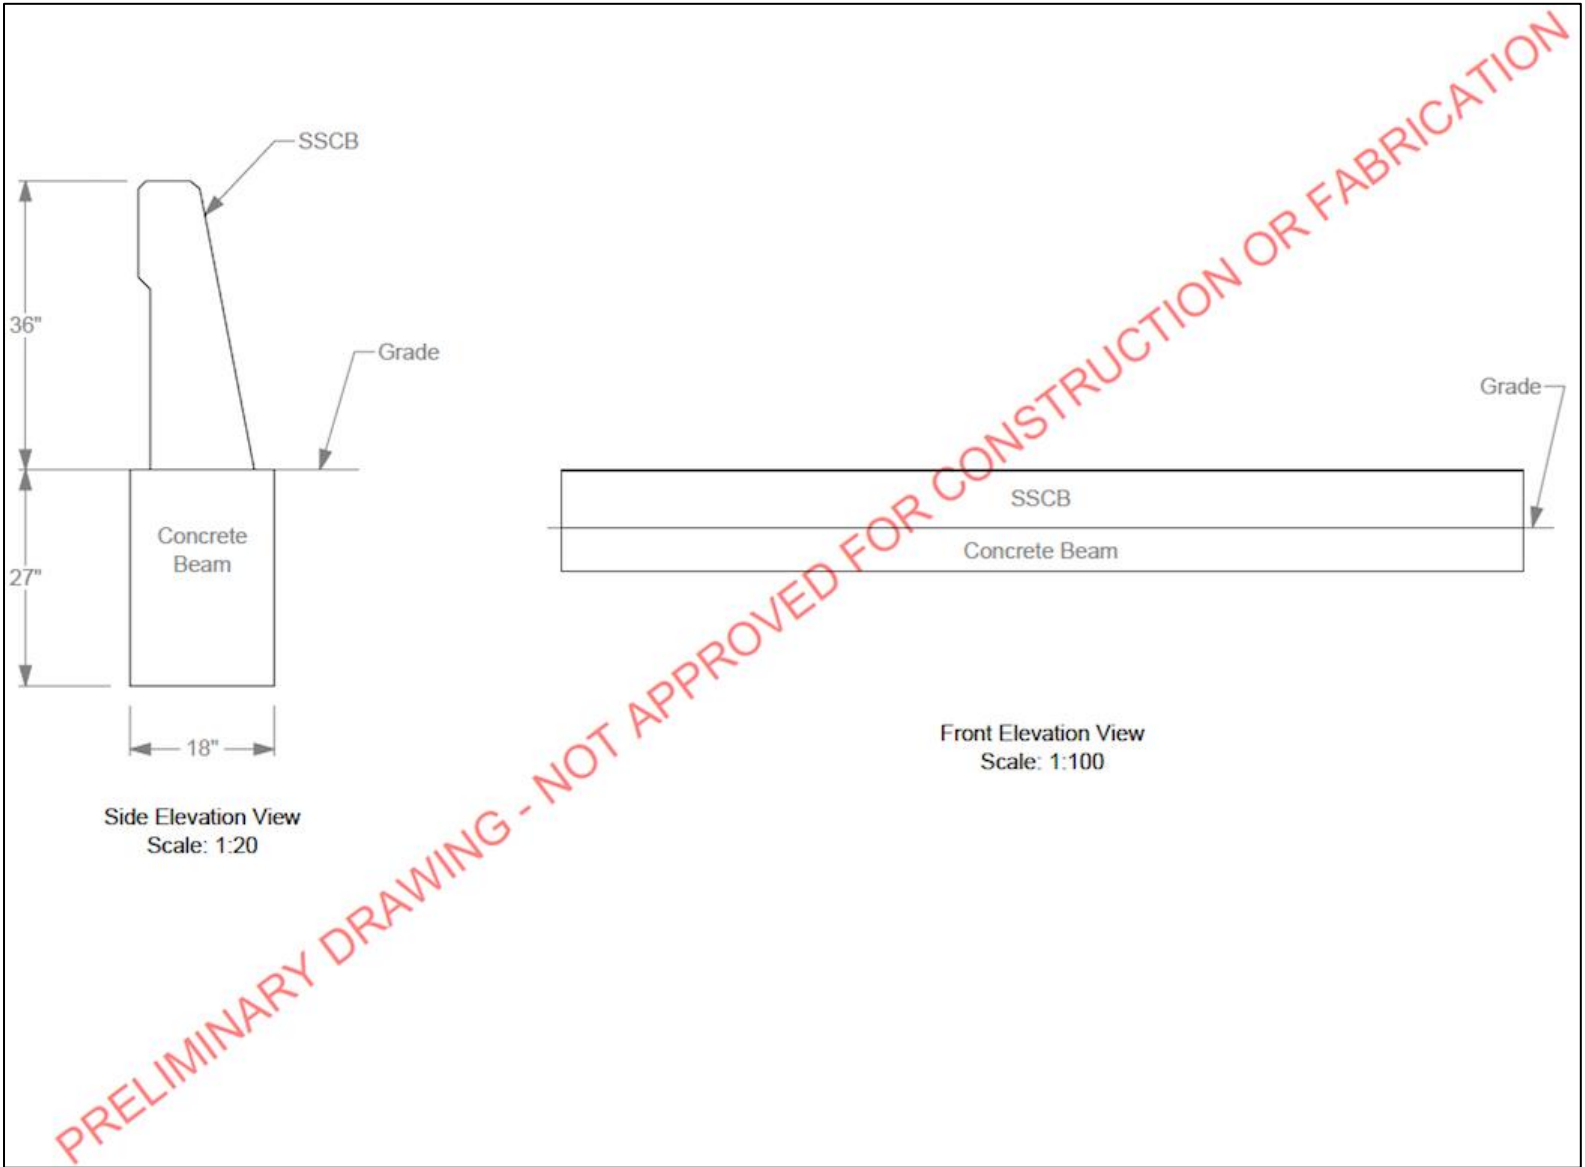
Design Concept 1 – Concrete Beam Foundation (TTI, 2017)
